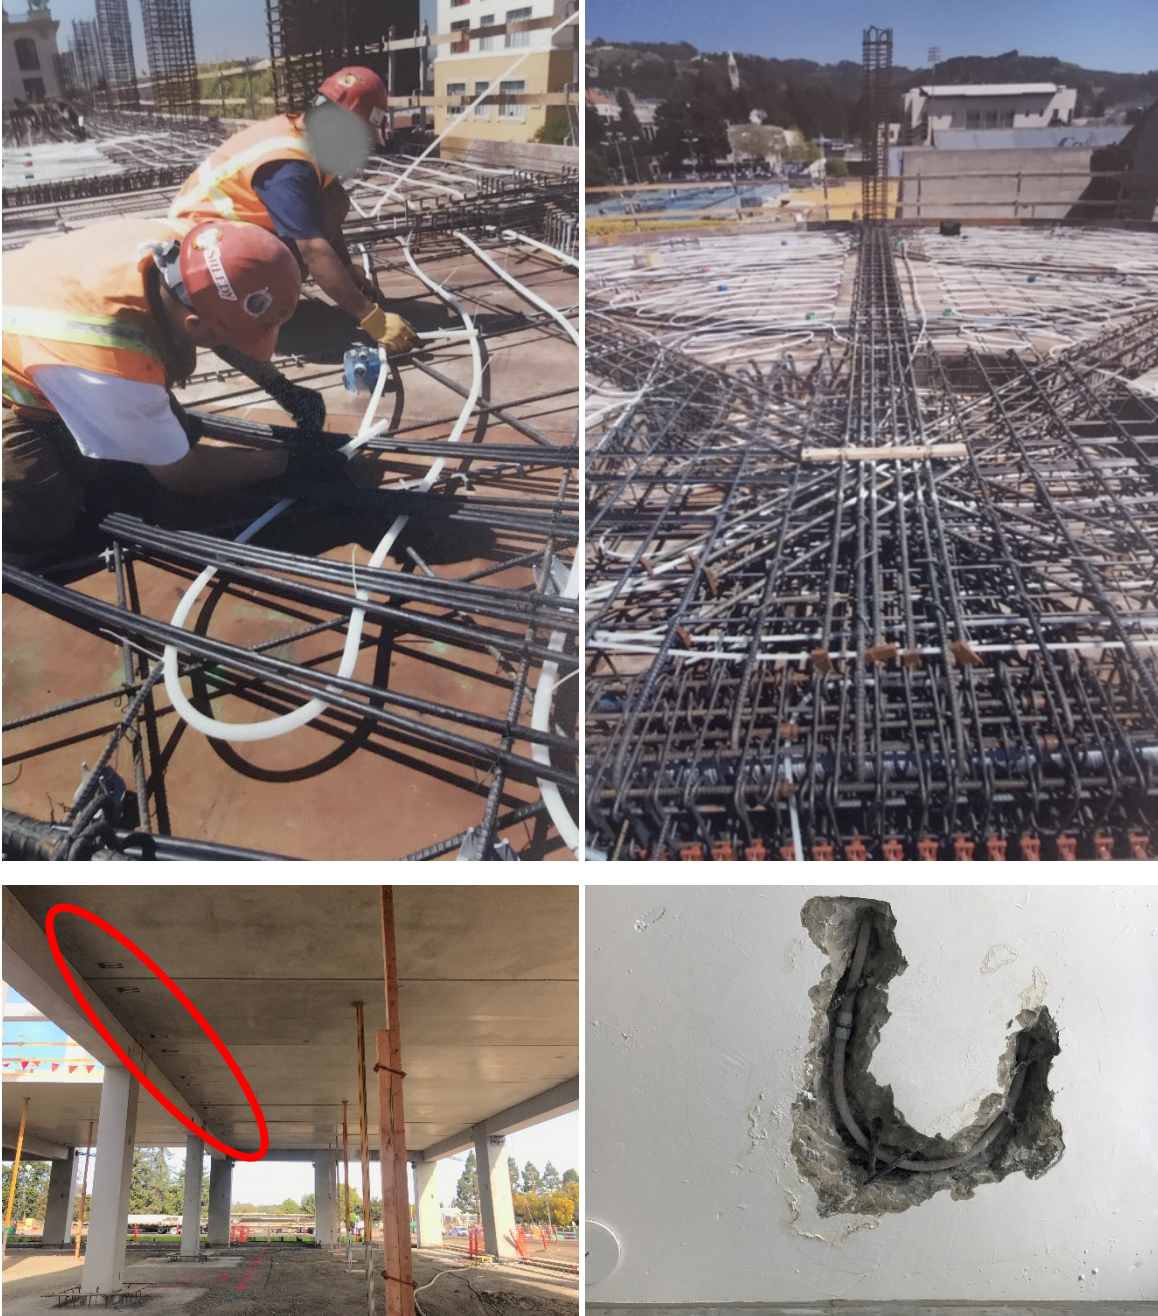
High thermal mass radiant (HTMR) buildings under construction. Top two images) Correspond to the same project where HTMR is constructed using a cast-in-place method. Photo courtesy of David Brower Center. Bottom left) HTMR is constructed through a precast method. The red ellipse shows tubing leads that will eventually connect to a manifold. Communication and coordination are crucial for the two HTMR construction methods. Bottom right) If the tubing is punctured after the concrete has set, then the leakage must be identified, and concrete needs to be chiseled out for repair.
